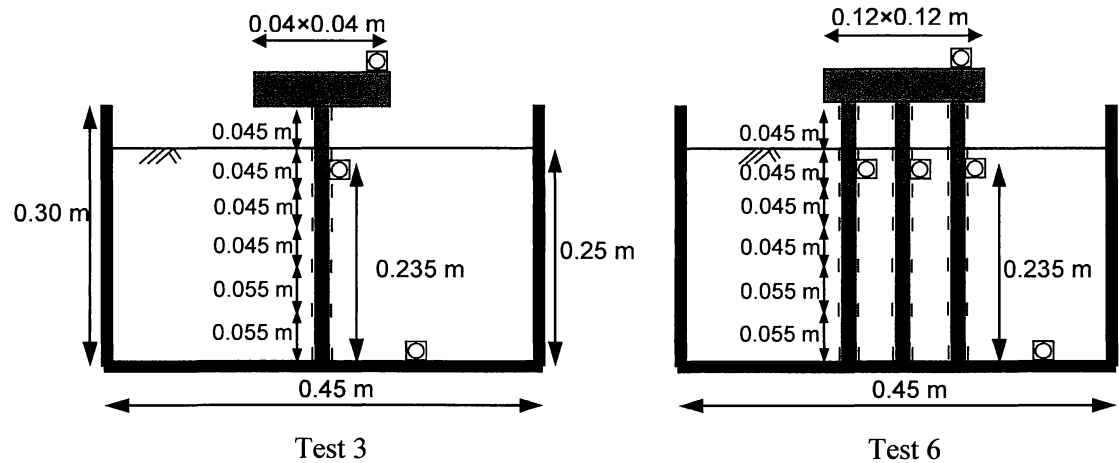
Illustration of piles supporting single degree of freedom tests setup: single pile (test 3); and group pile (test 6)
